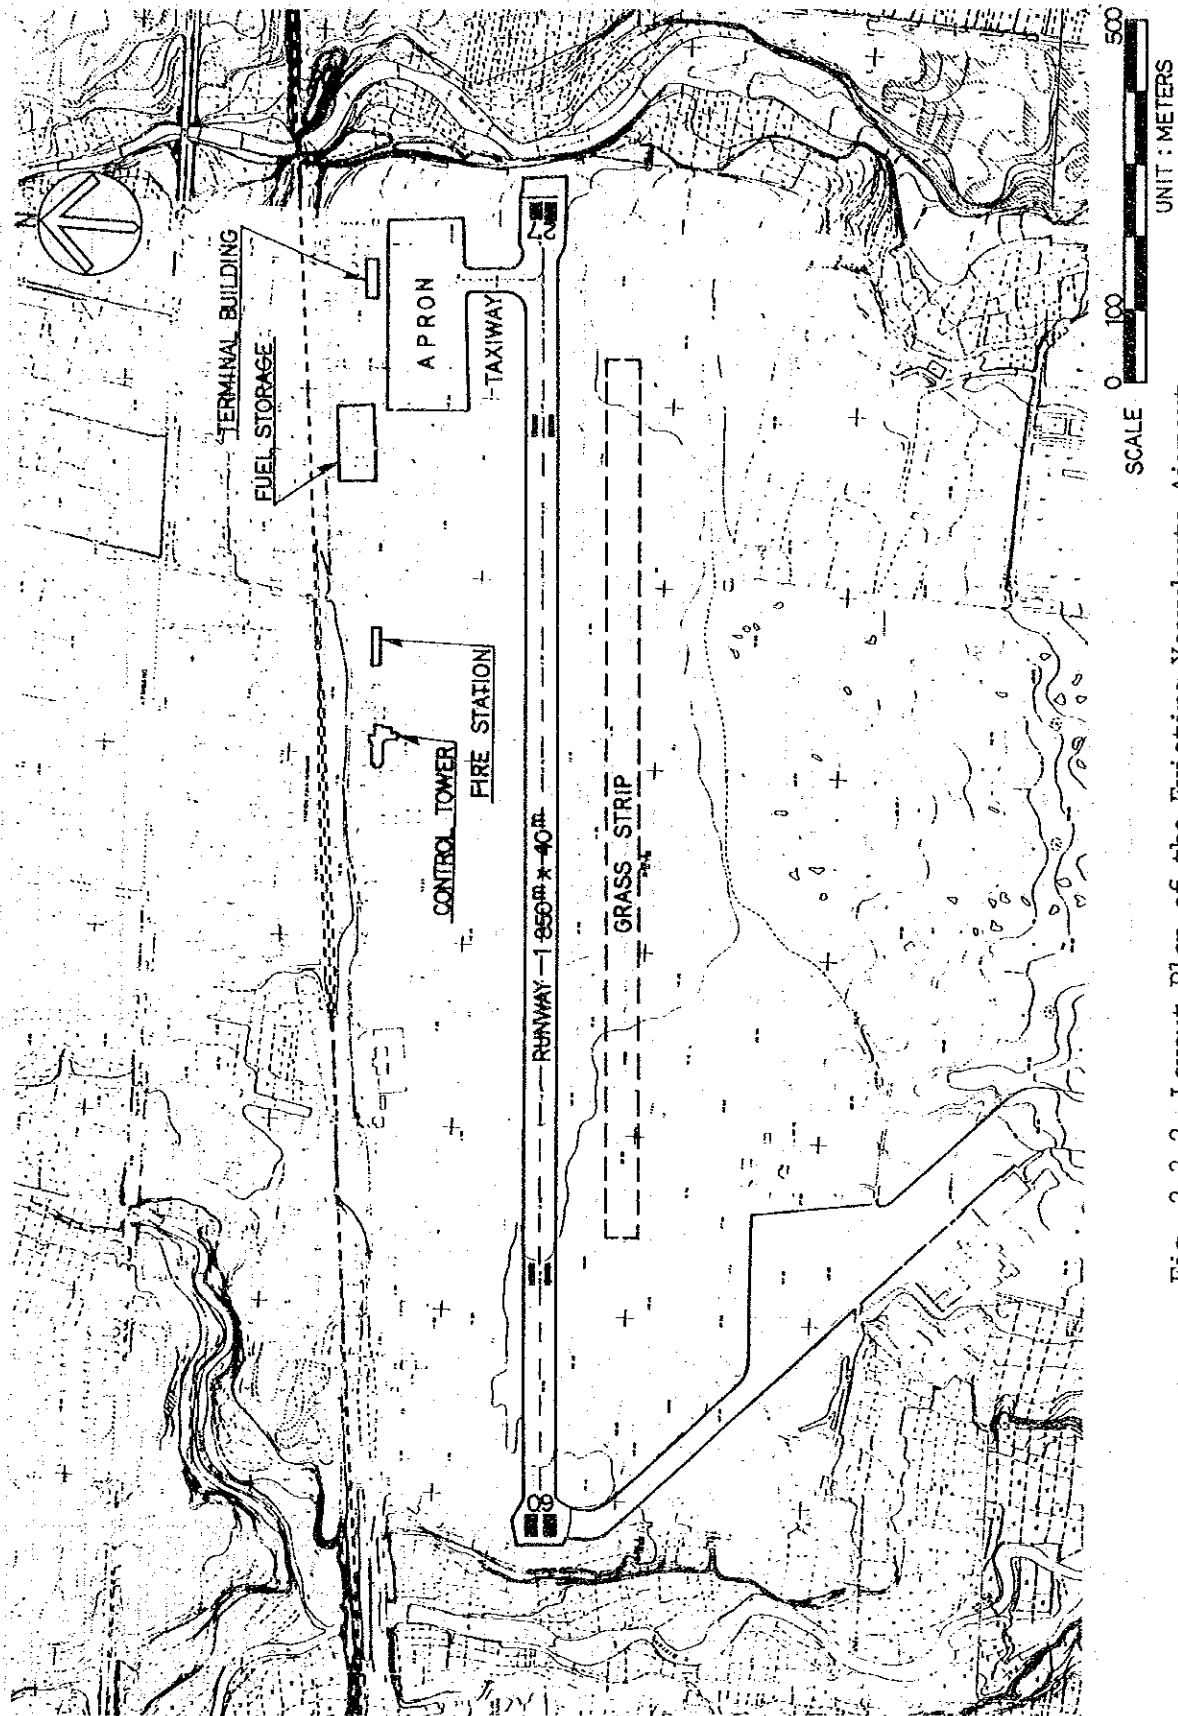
Layout Plan of the Existing Yogyakarta Airport
